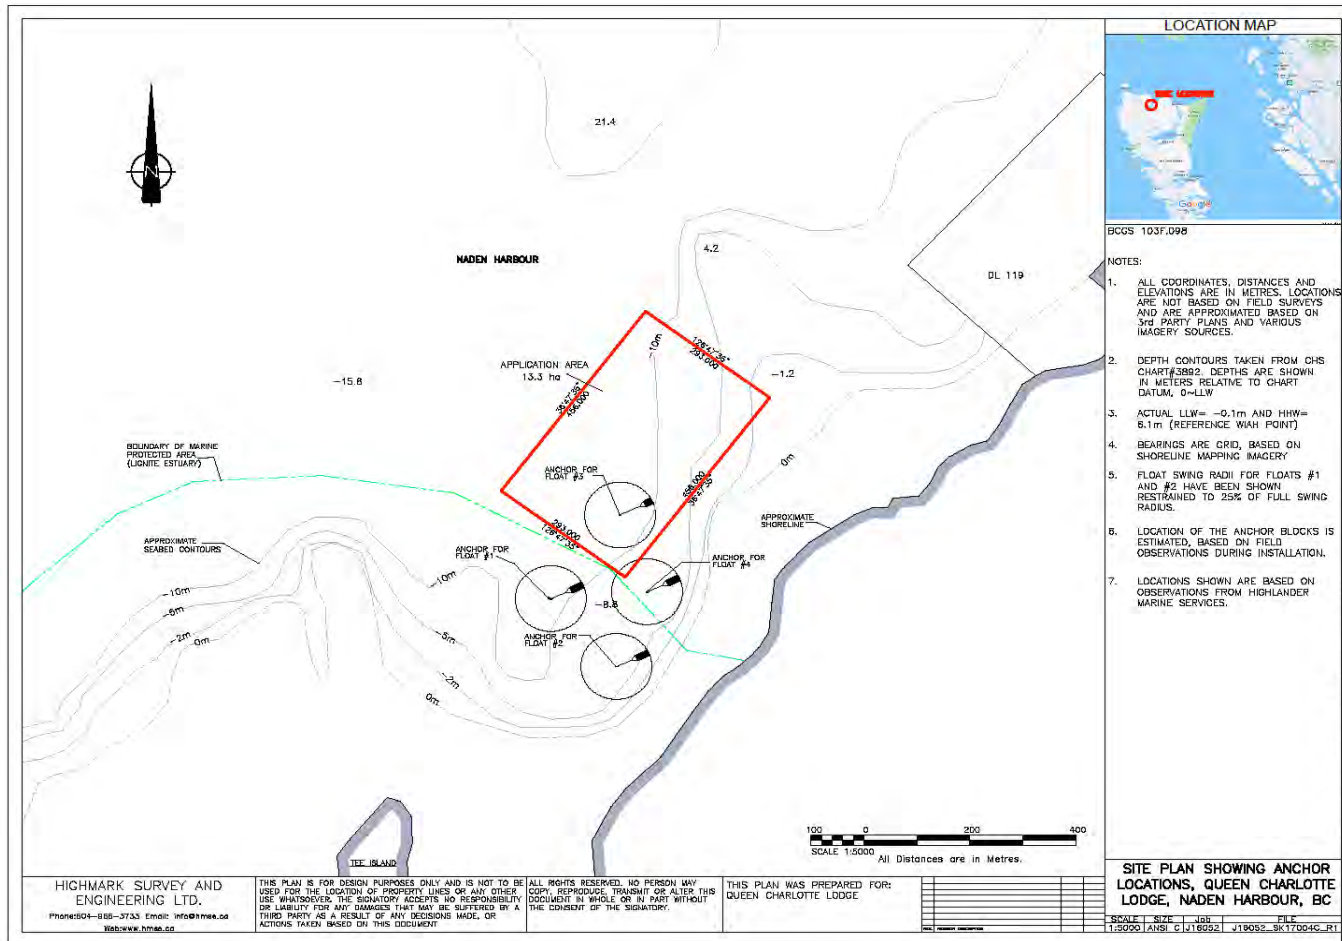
3: Site Plan and Proposed Relocation of Anchors and Mooring Buoys
